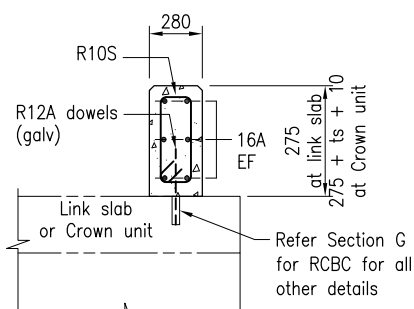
HEADWALL FOR R C BOX CULVERTS
